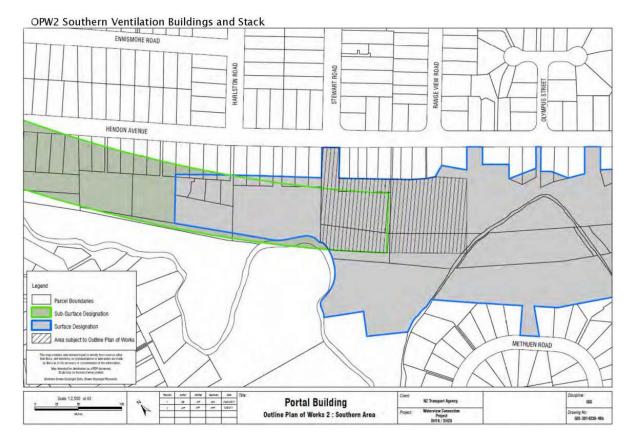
Southern Ventilation Buildings and Stack
